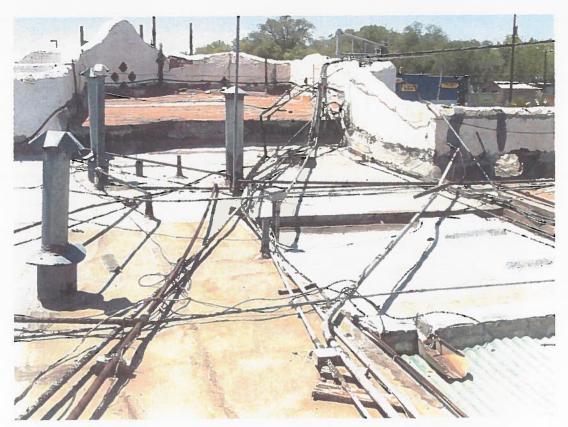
Office/Lobby Roof Pipes & Electrical Lines
